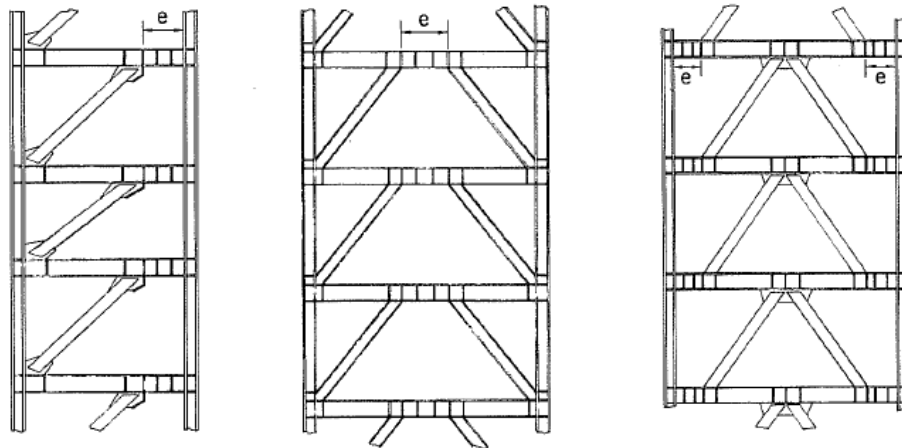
Typical bracing arrangements for EBFs (Popov and Engelhardt, 1988)
